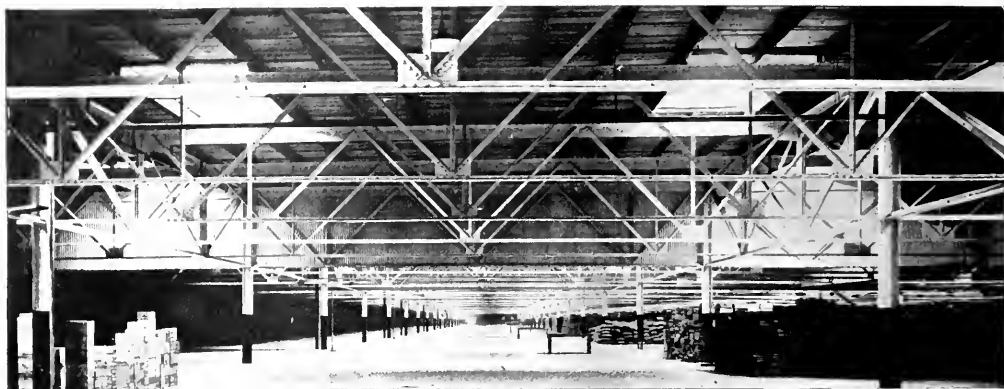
A SPRINKLERED FLOUR MILL IN BROOKLYN, N. Y. NOTE CURTAIN BOARDS INSTALLED TO BREAK UP CEILING AREA AND BANK HEAT AT SPRINKLER HEADS
